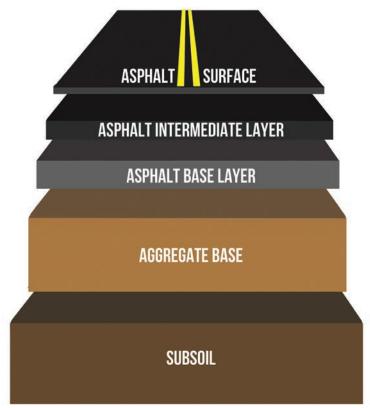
A typical asphalt pavement is comprised of multiple layers.
